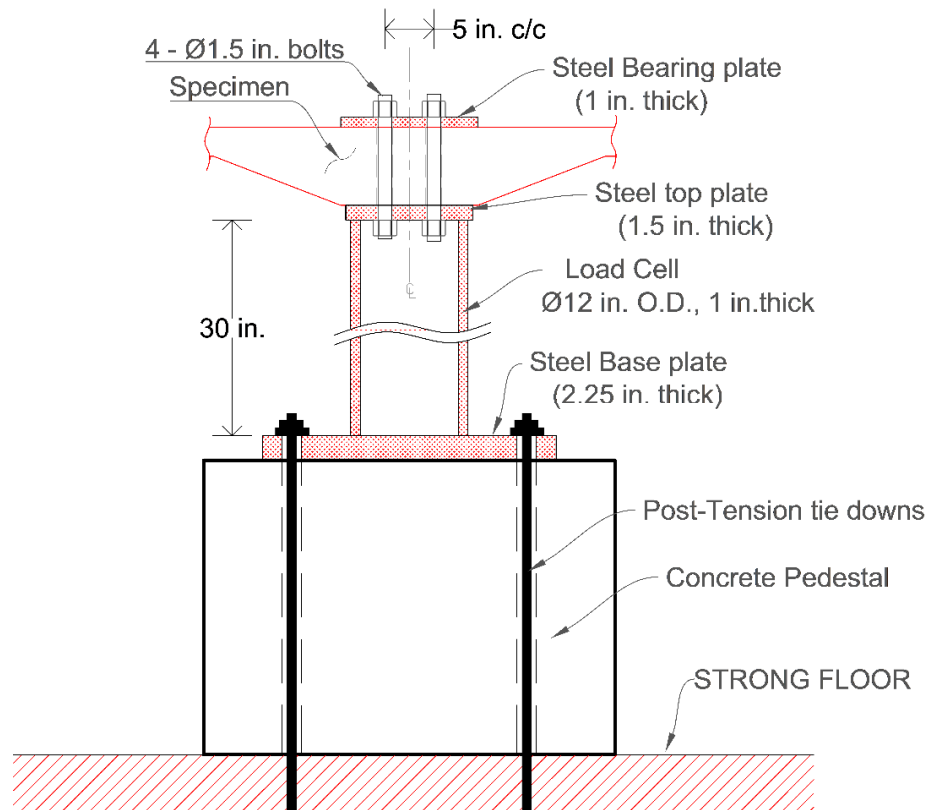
Connection detail between the multi-axis load cell and test specimen.
